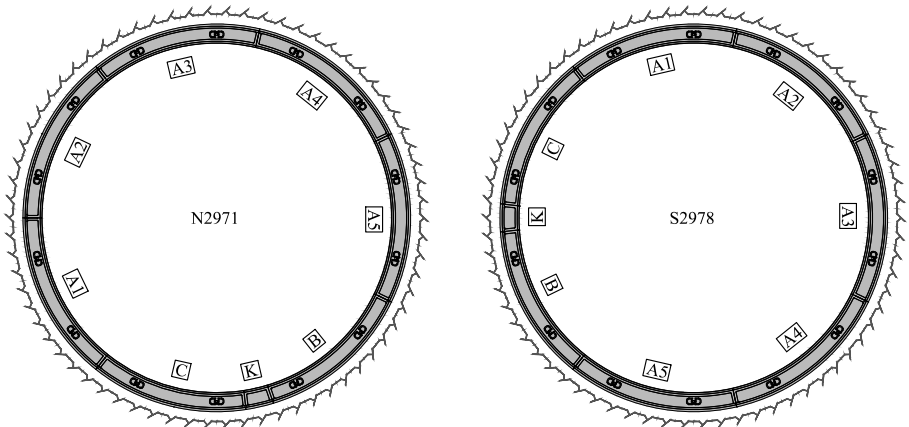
Segment orientation in tunnel sections N2971 and S2978.
